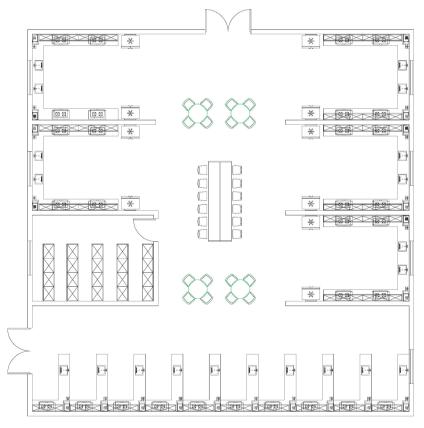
Floor plan of shared kitchen 图 6. 共享厨房平面图
